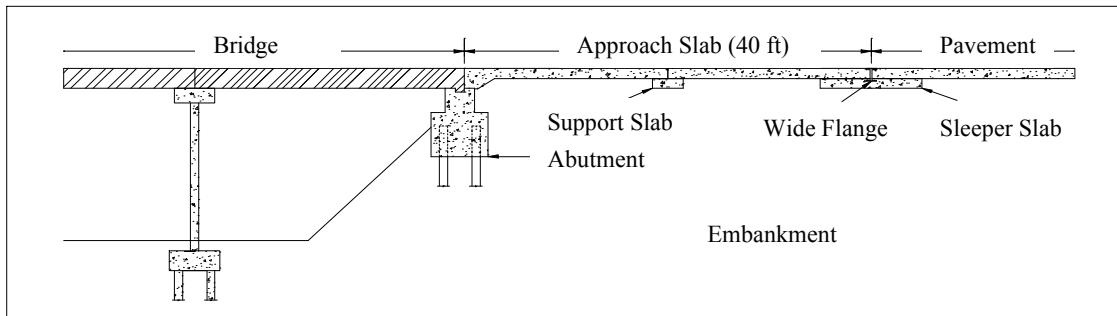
Cross Section of a Typical Two-Span Approach Slab with a Wide Flange.
